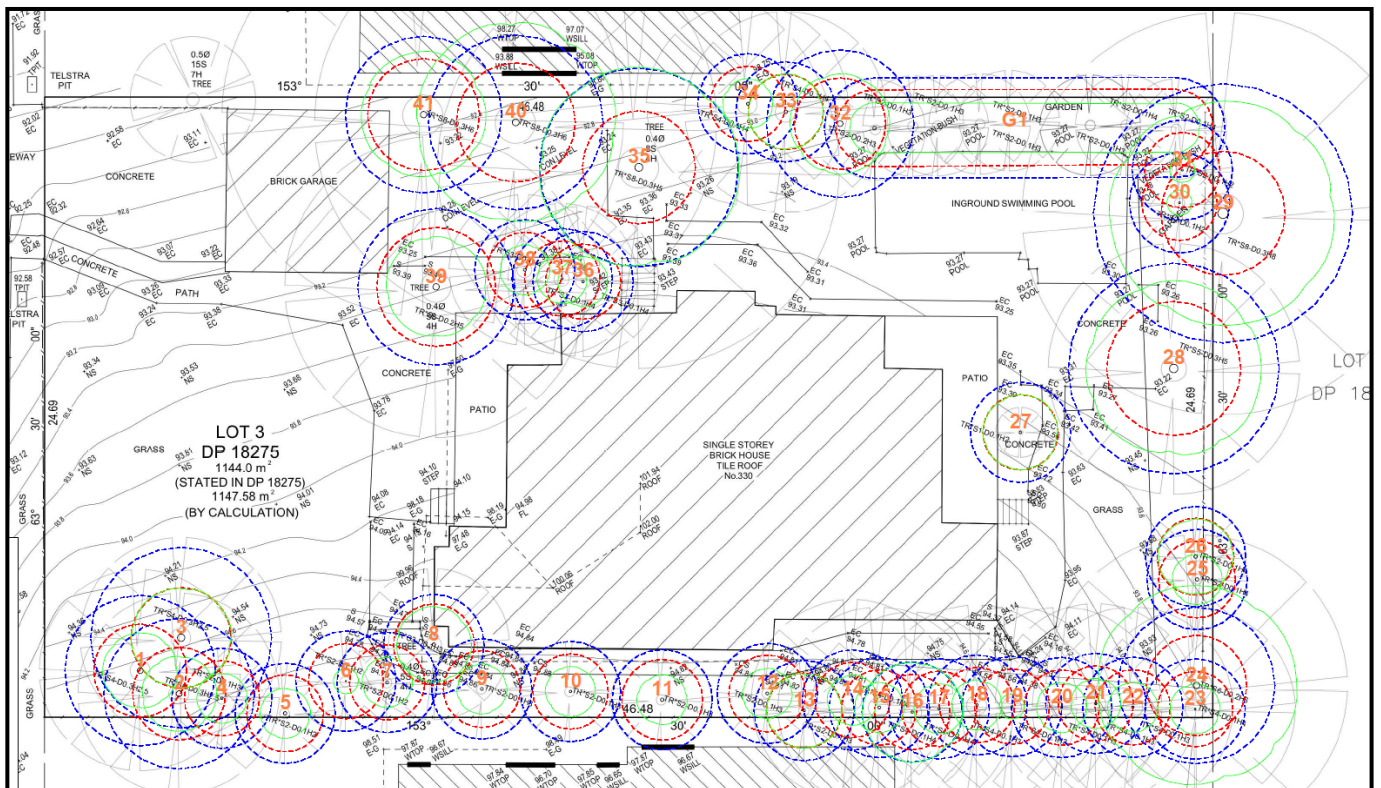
Survey of trees on subject property (Note: T29 is located on adjoining site to the rear).
